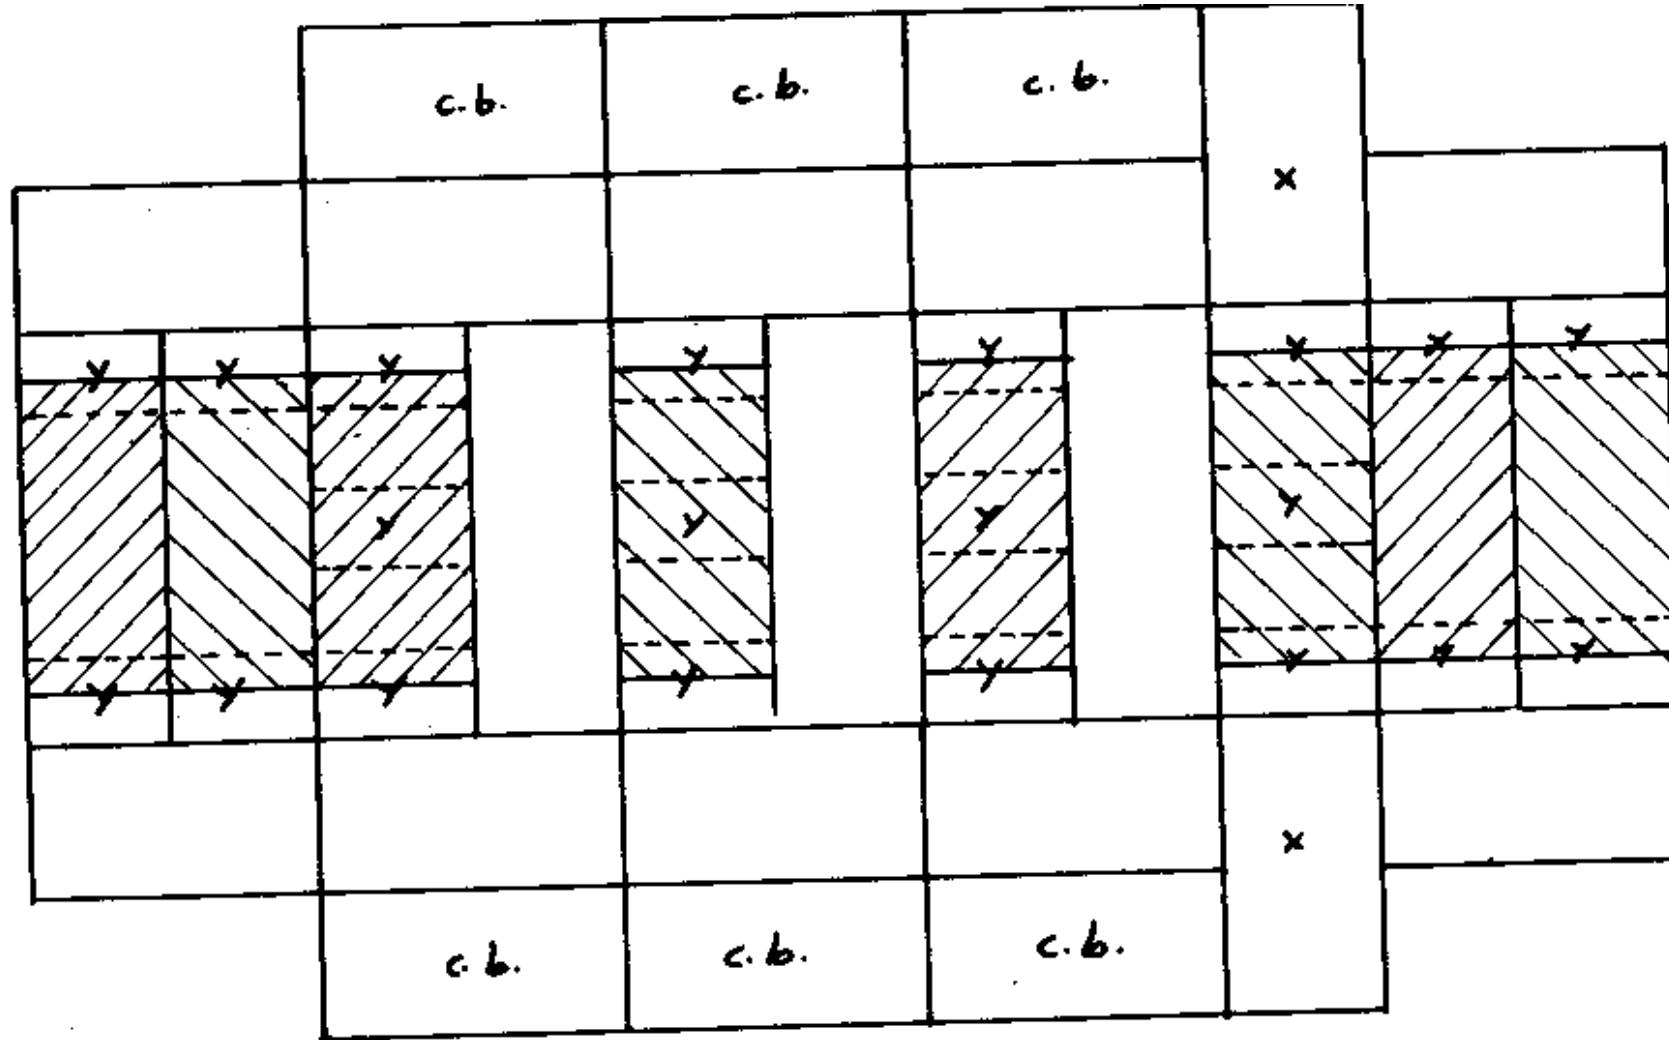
RECTANGULAR KILN: CROSS-SECTION EE' TOP VIEW (SEE FIGURE 3)
